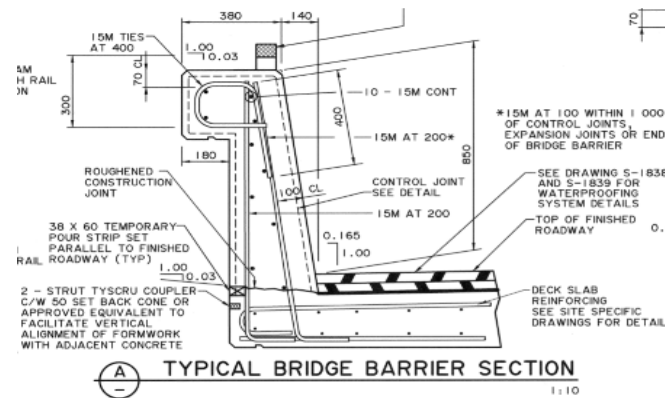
Single Slope bridge barrier drawing (Alberta Transportation, 2017).
